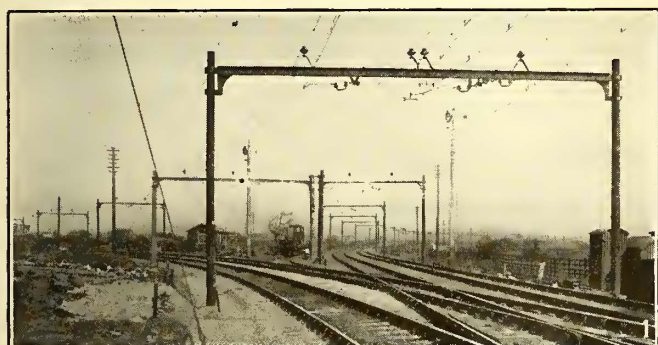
Overhead construction on Midland Railway electrification. Wood-pole and channel-iron strut in foreground; structural steel bridge in background.
